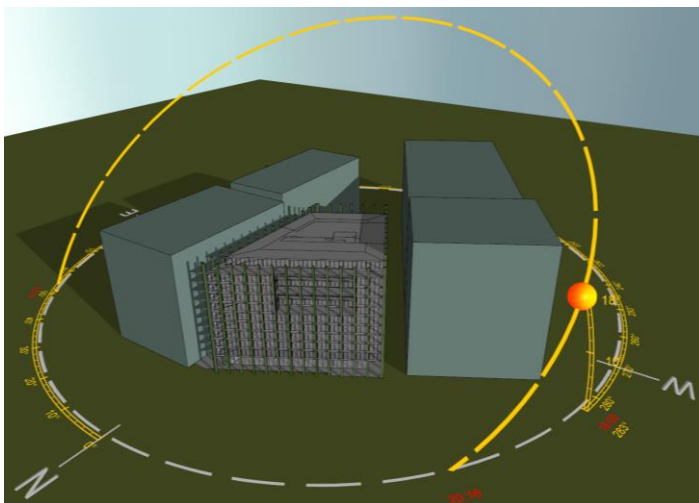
Building B5 – Sun Angle at 18:00hrs (July 1st)
